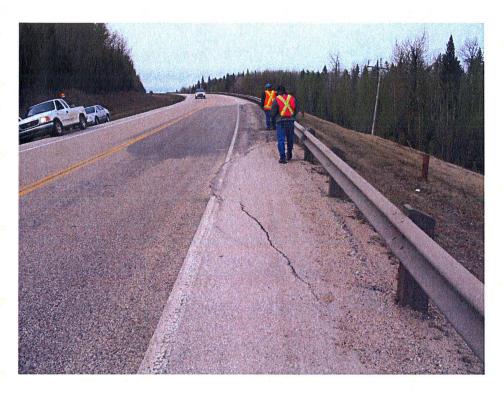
Looking West along Highway at cracks, May 2, 2006.
